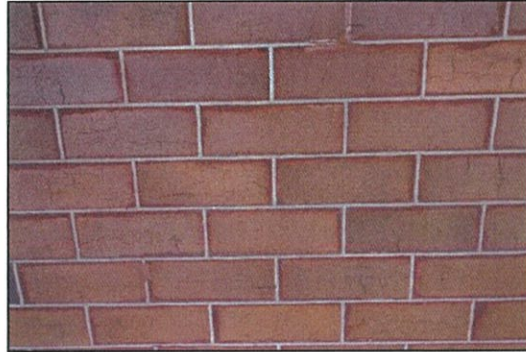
Close-up view of facade and section of intact tuck-pointing.
